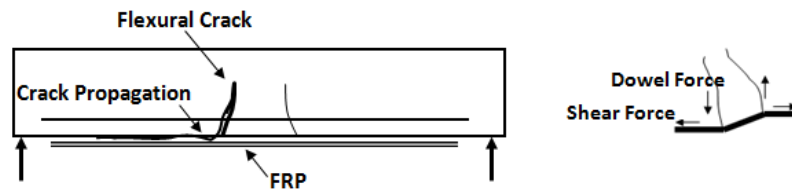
Typical intermediate crack (IC) debonding failure.
